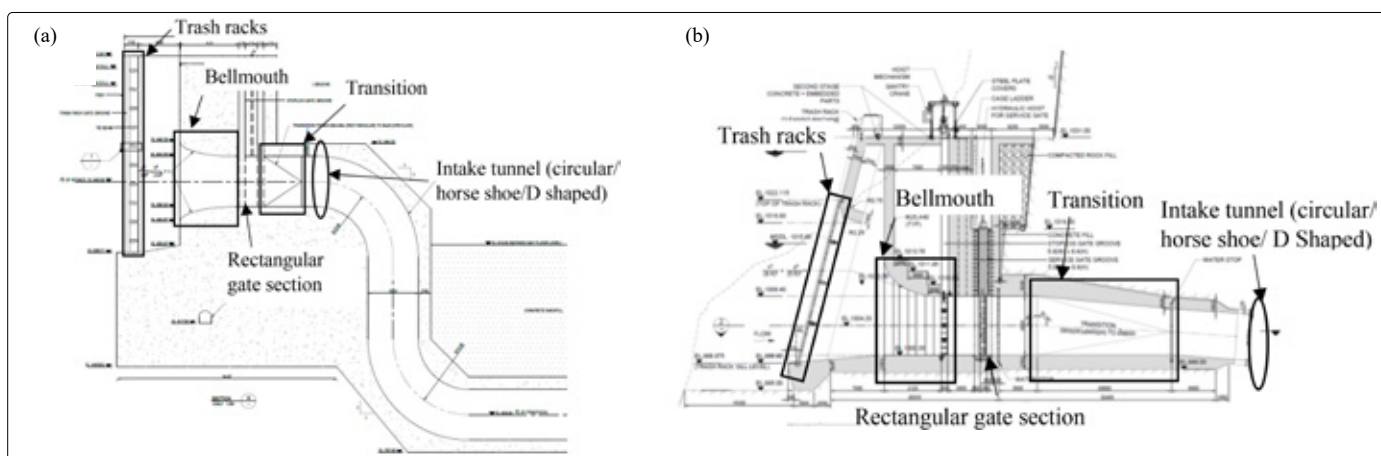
Typical section of power intake (a) consist of conduits embedded in dams; (b) excavated as tunnels
